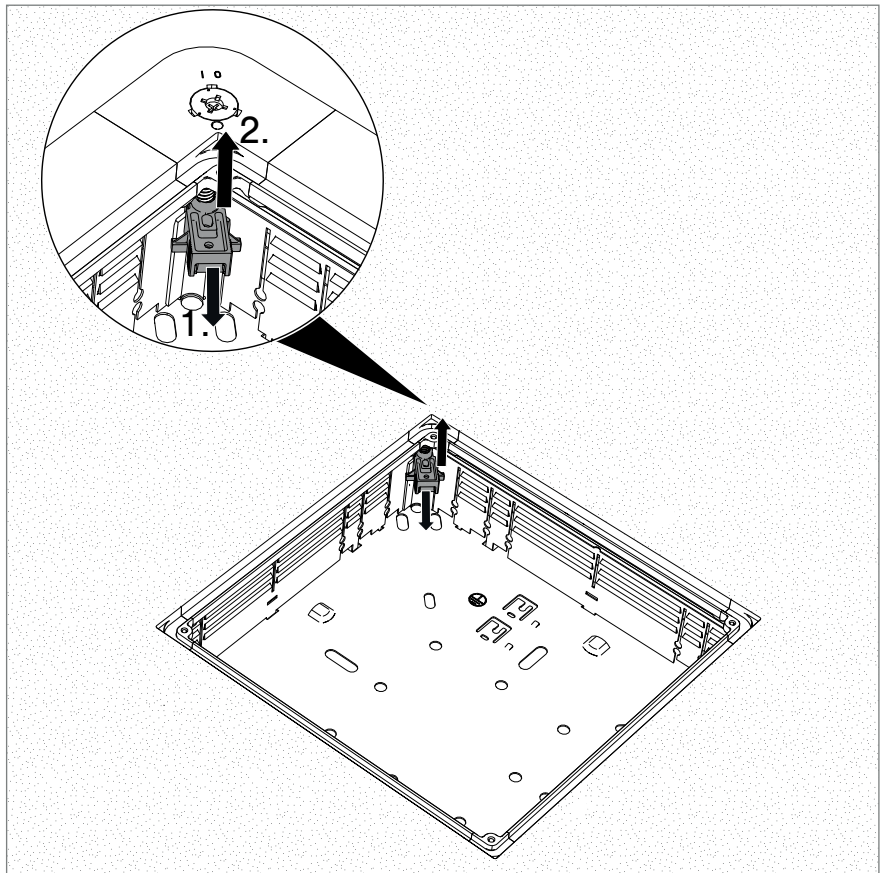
Decoupling the underfloor junction box/underfloor device socket (from the inside)
